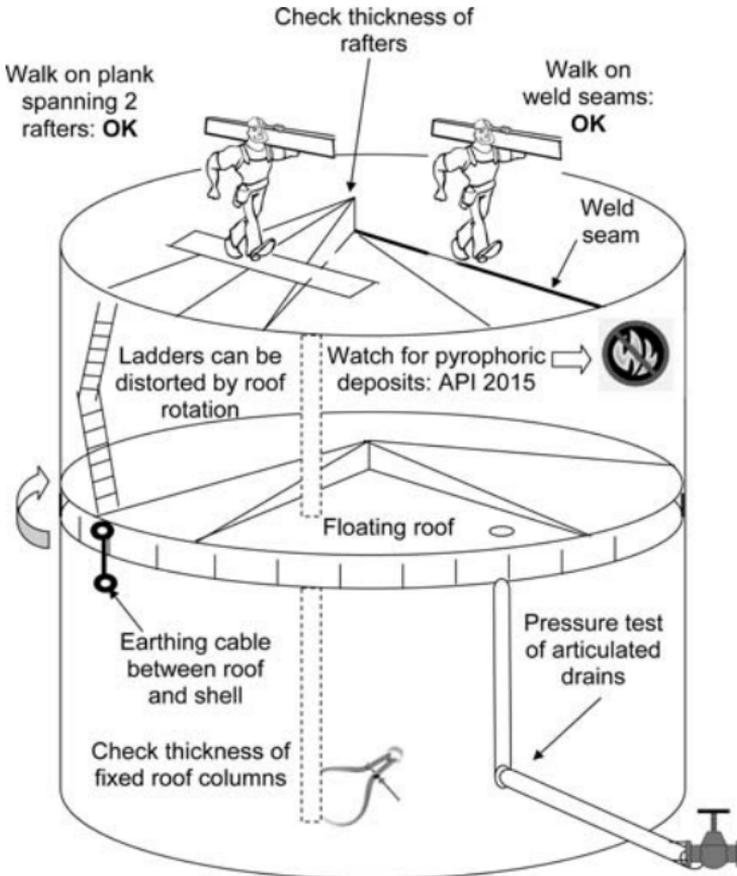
Tank roof inspection: API RP 575 (7.2.5)
